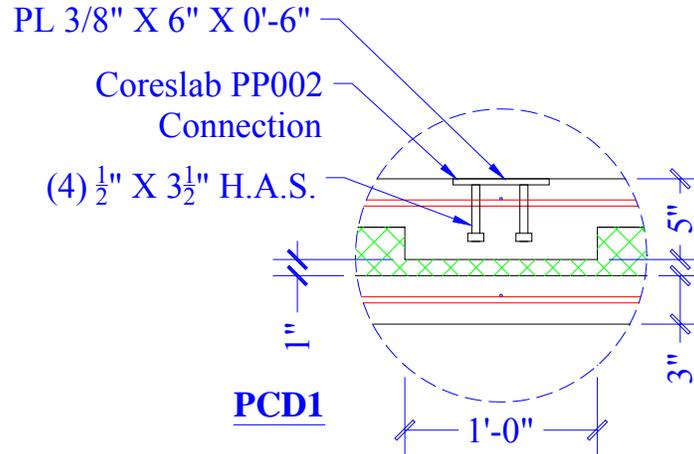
Coreslab Two-span Panel PCD1 Midspan Connection
